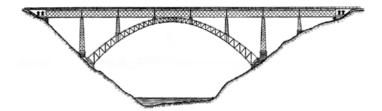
Open Spandrel Steel Arch Bridge, adapted from (Gentile & Saisi, 2013)
